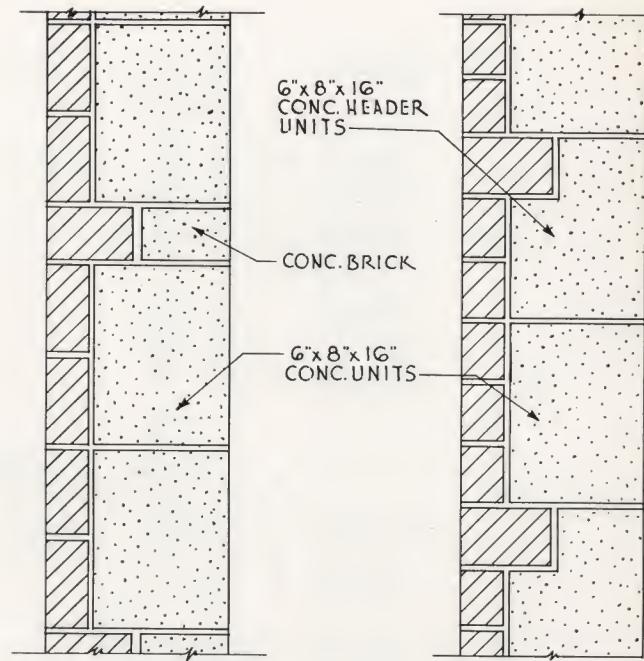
Two new methods of bonding brick facing to concrete masonry to produce 8-in. walls.
